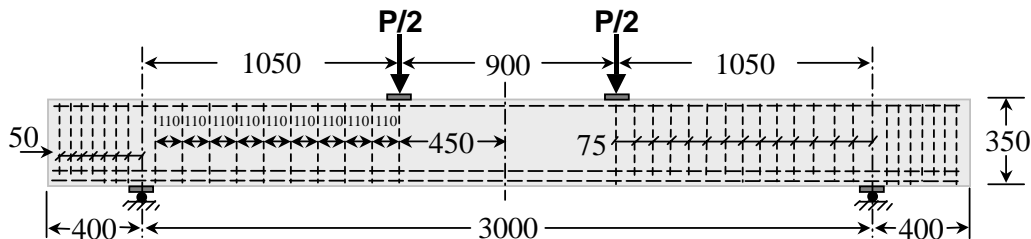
Loading condition and stirrup arrangement (unit: mm)
